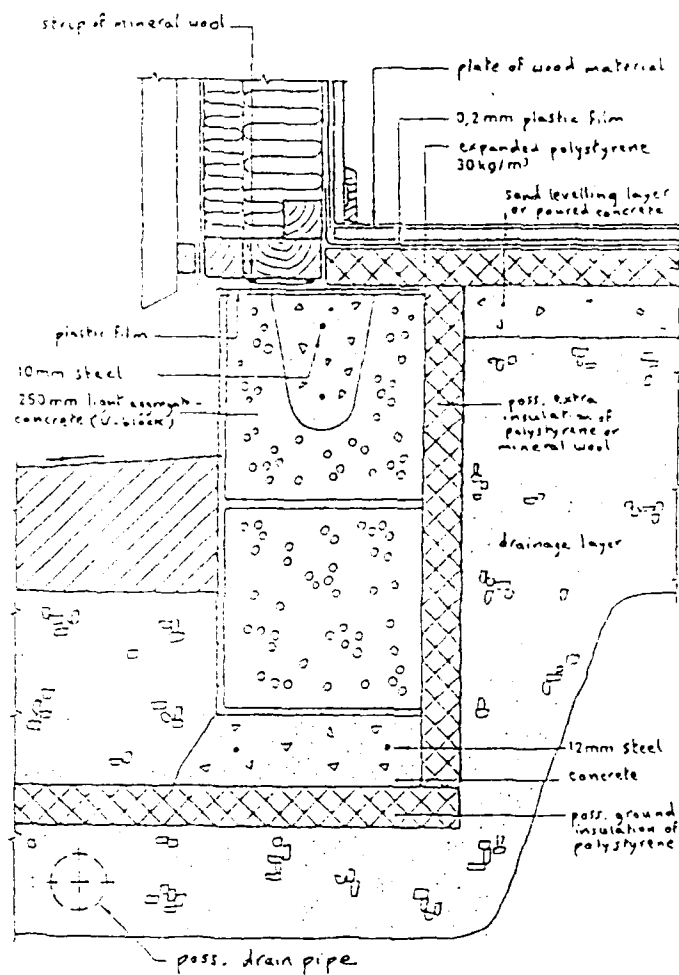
A light floor with foundation wall of light aggregate concrete.
